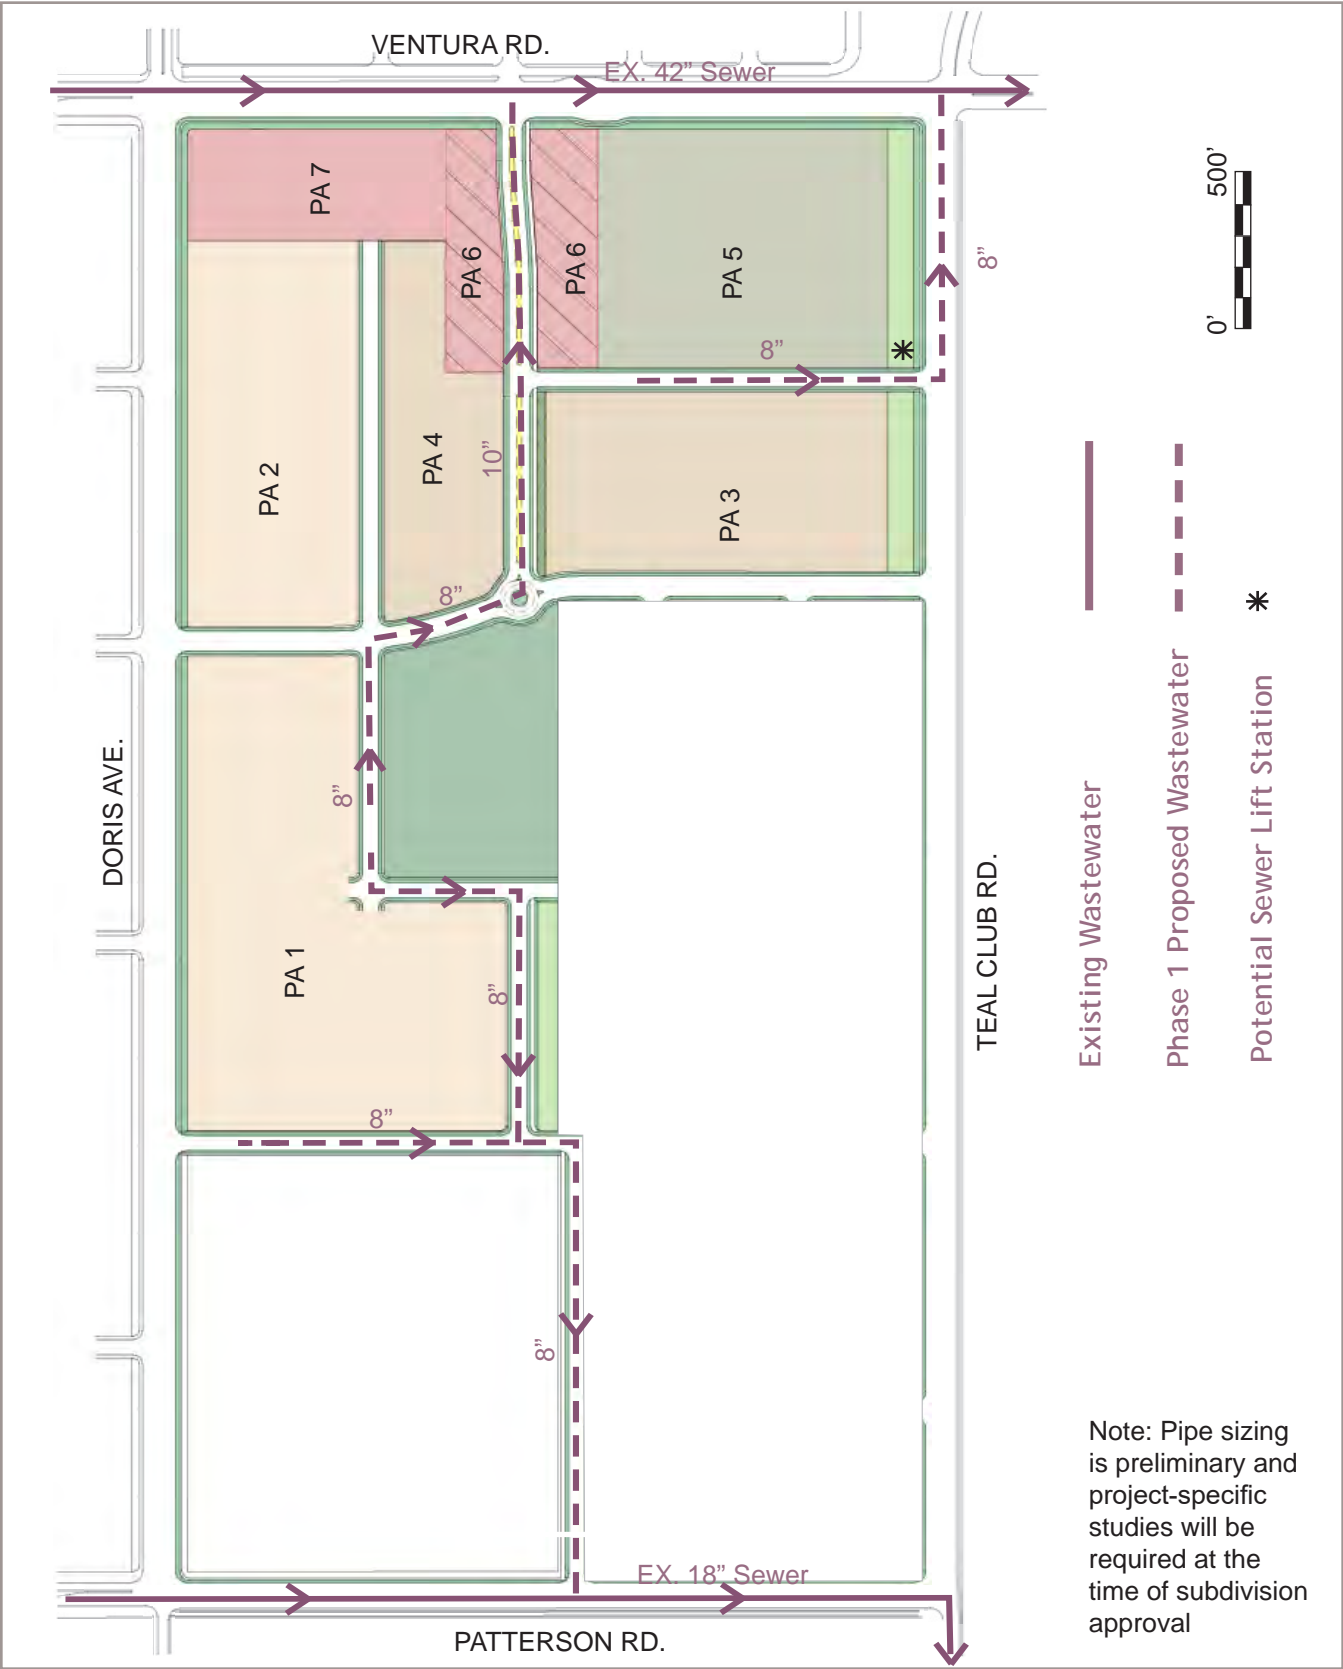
PROPOSED BUILD-OUT WASTEWATER SYSTEM
